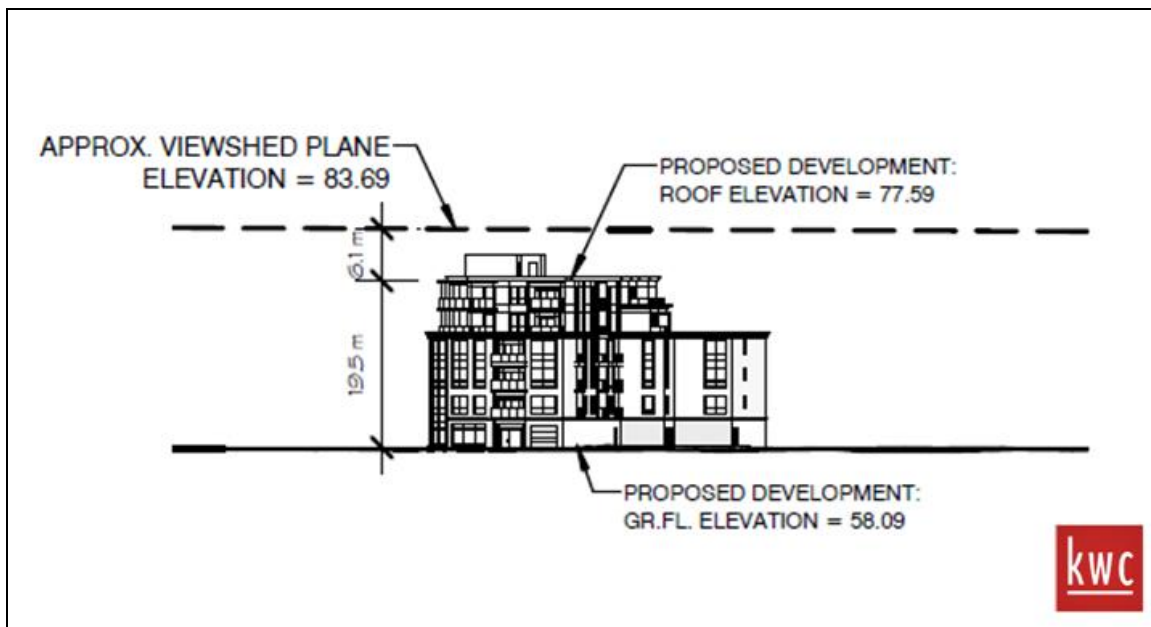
Official Plan Annex 12 - Beechwood/Parliament View Shed
